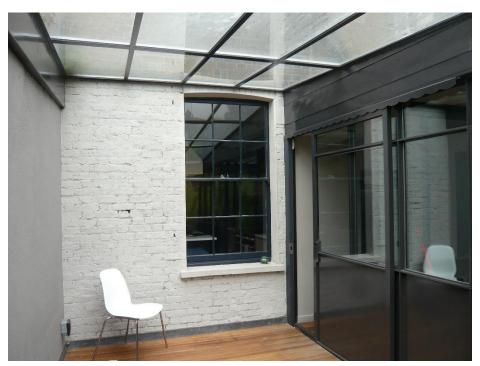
Decking covered with a glazed roof beyond the kitchen window
